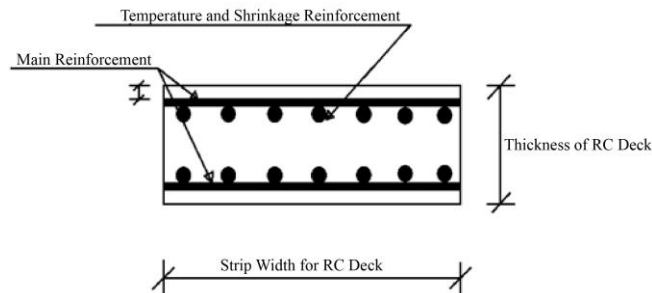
Cross-section elevation for RC bridge deck showing details of steel rebars
